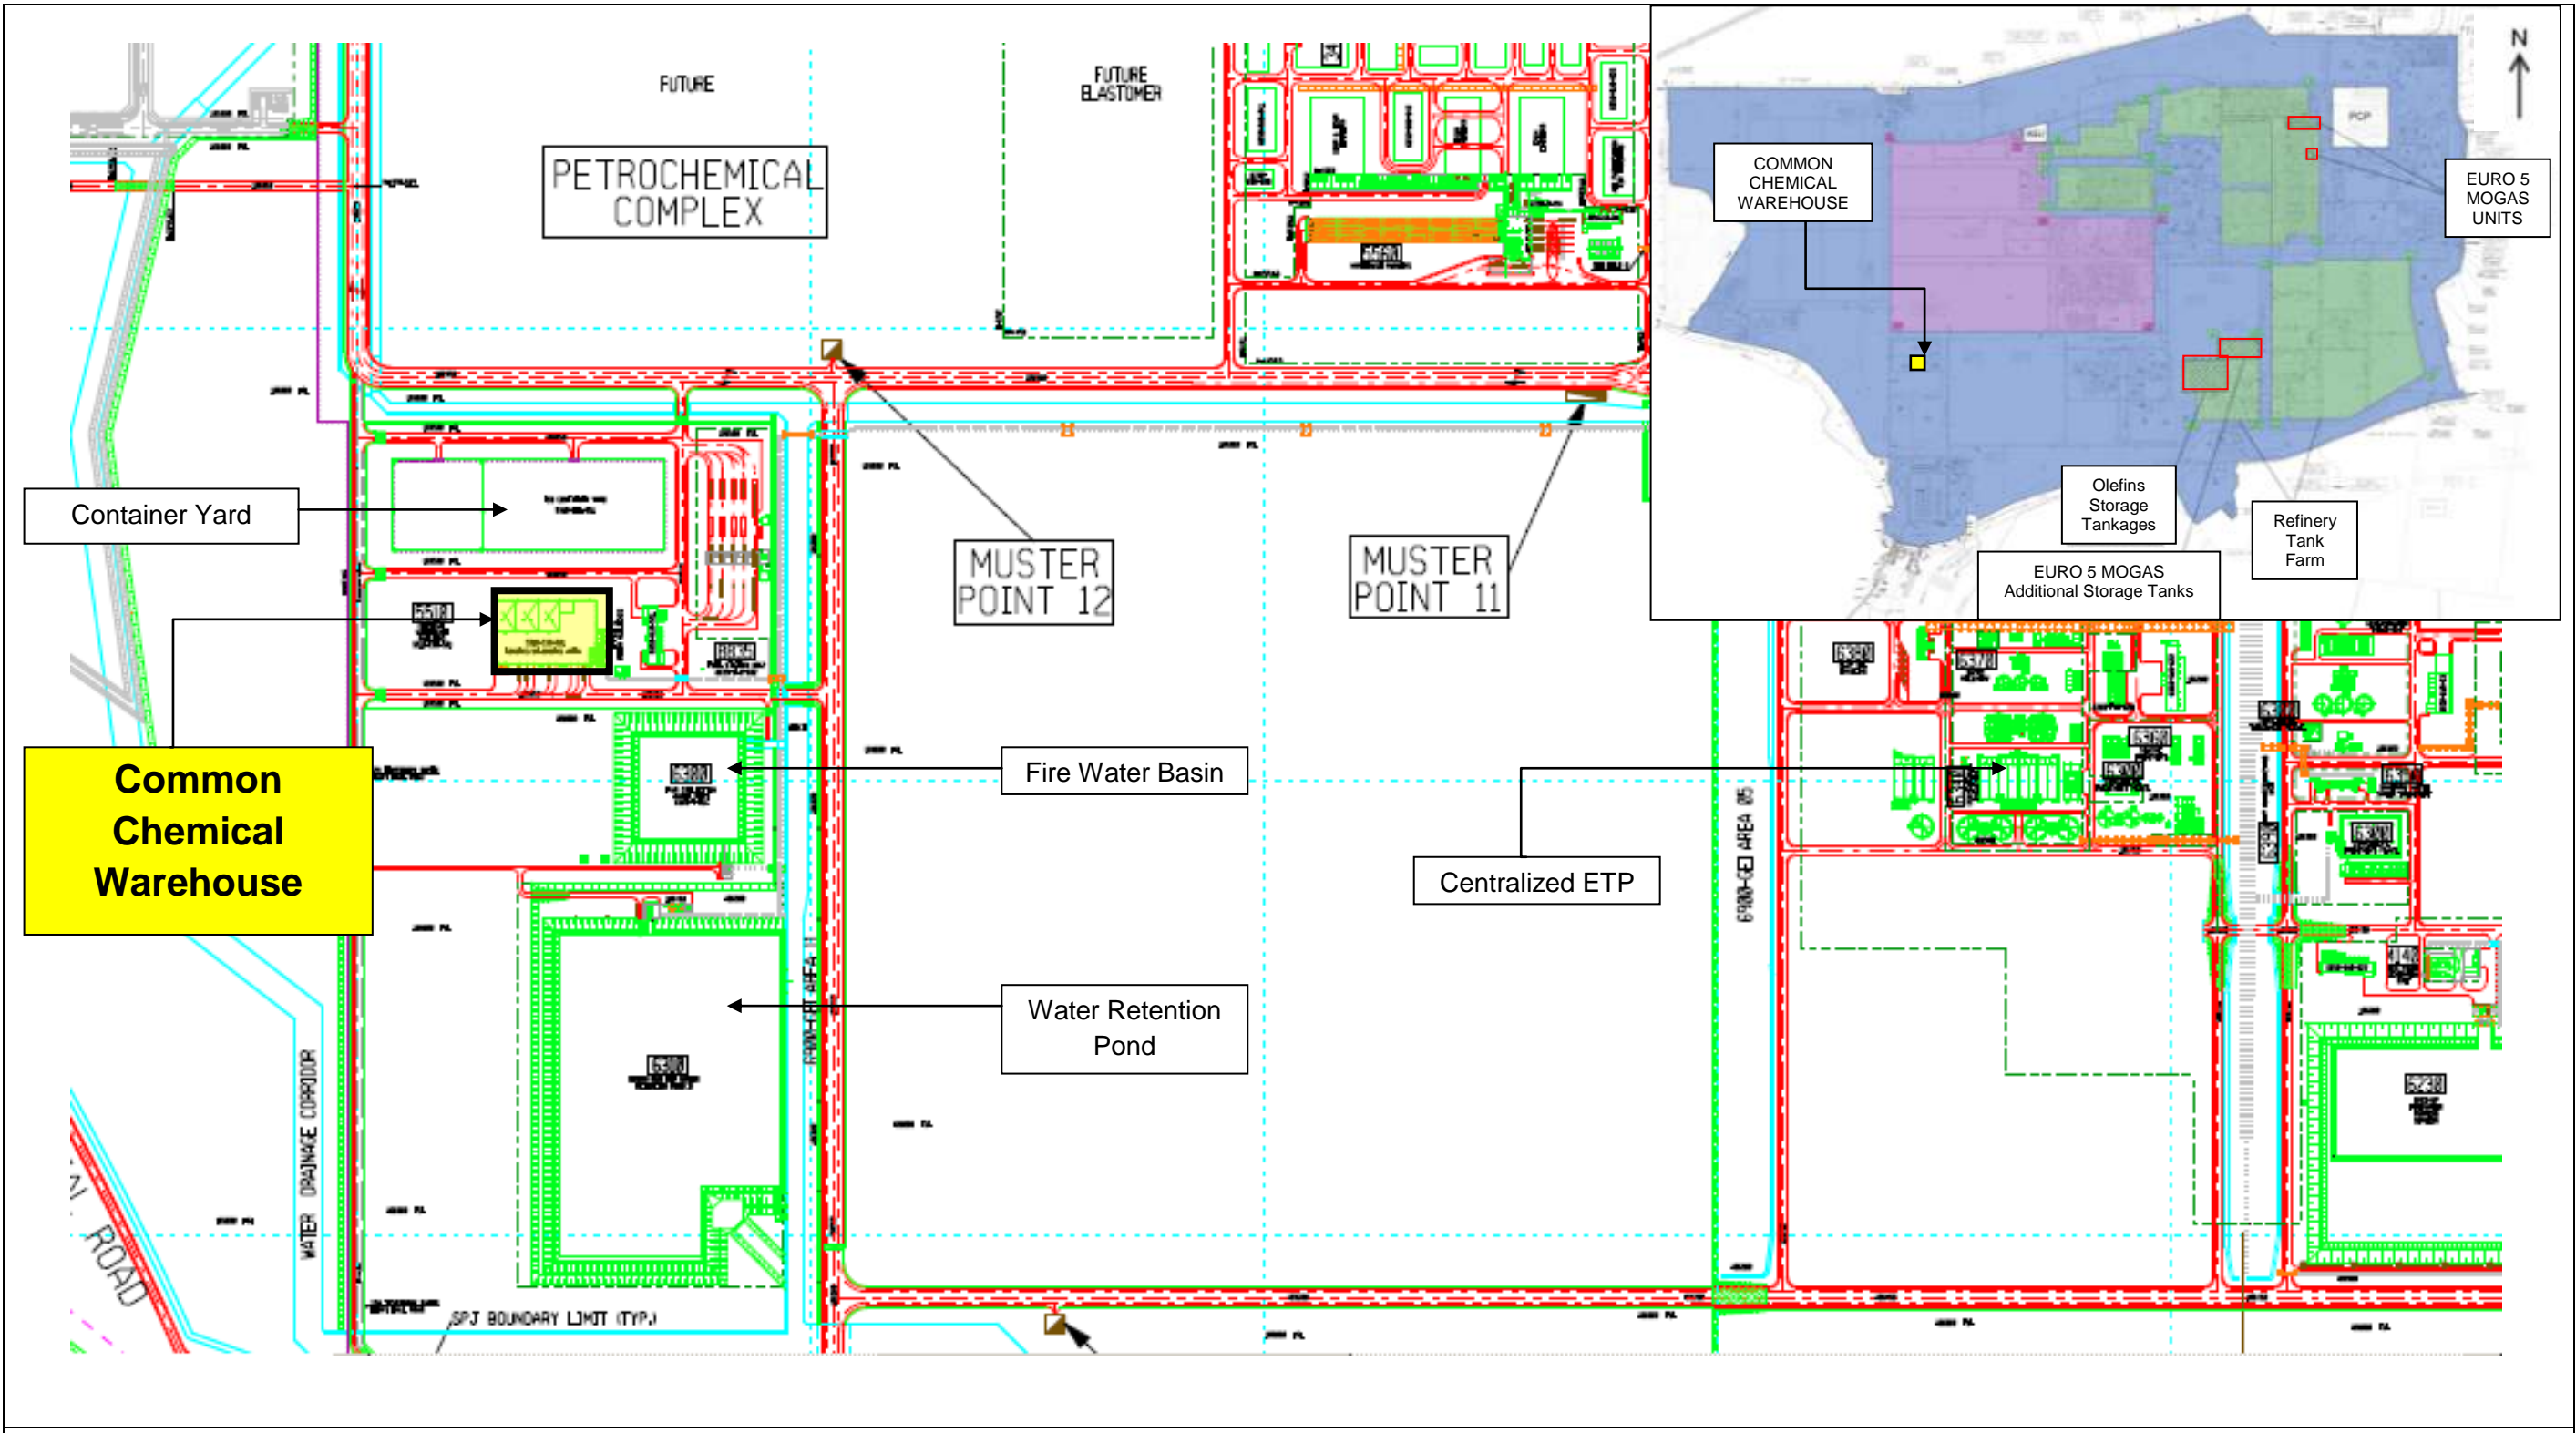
Common Chemical Storage Warehouse Location Within RAPID Plot Plan Layout.
